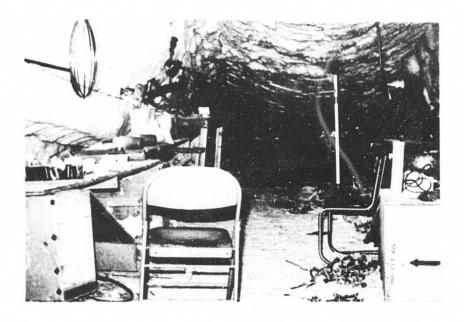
Roof sags most where the inclined drift and railroad trench intersect.
